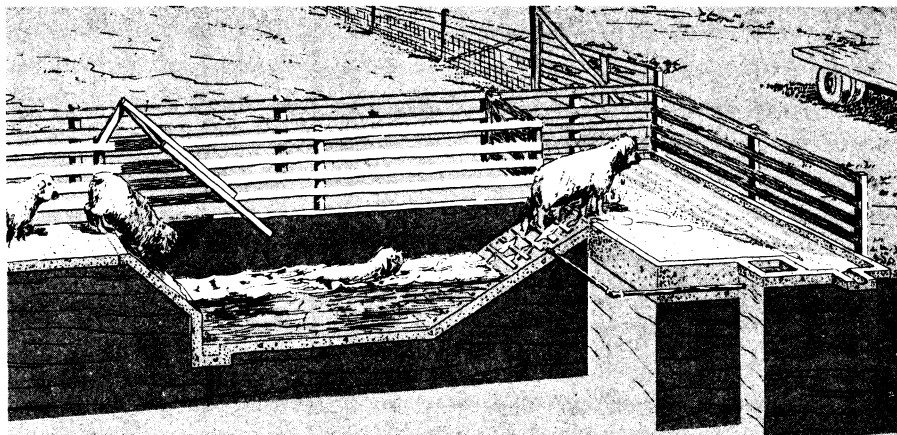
Permanent concrete dipping vat. (USDA Plan 5390)
